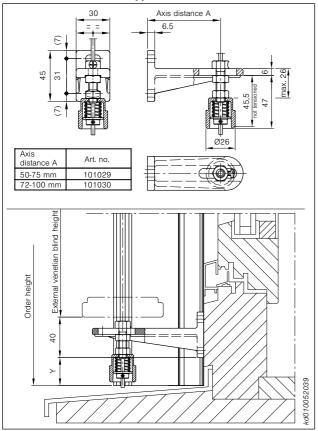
Tension cable bracket type S01 for 80 mm flat slats
